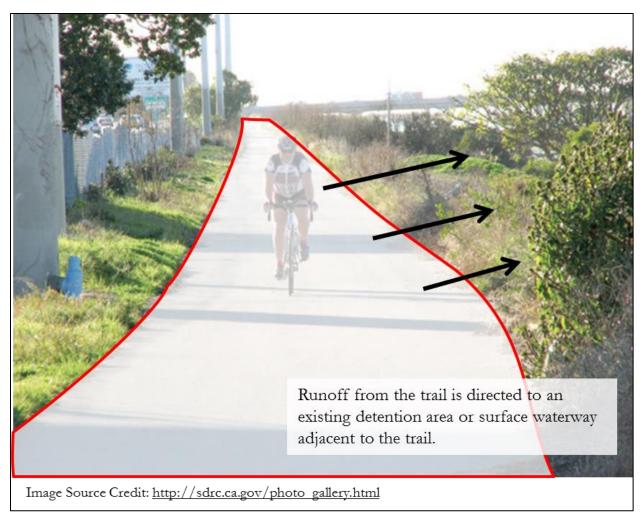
Schematic of a trail where the runoff does not comingle with street or road runoff
